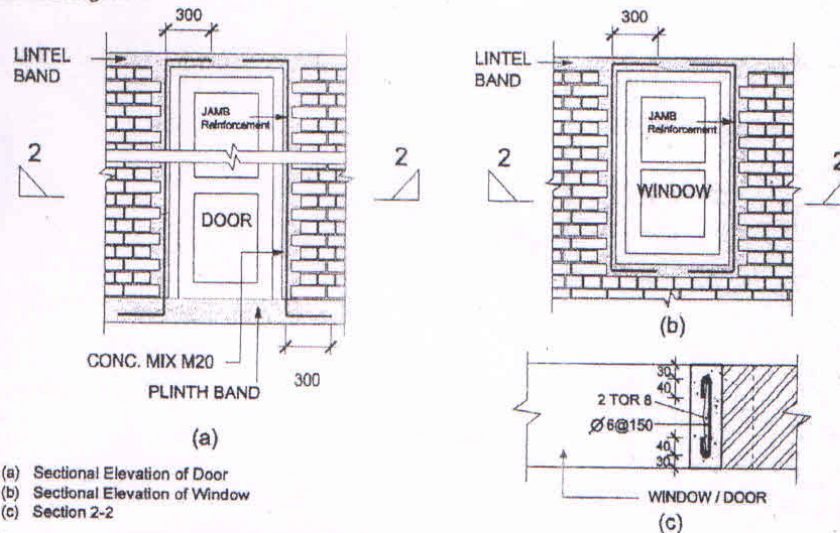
Typical Details of Providing Vertical Steel Bars around doors/windows
